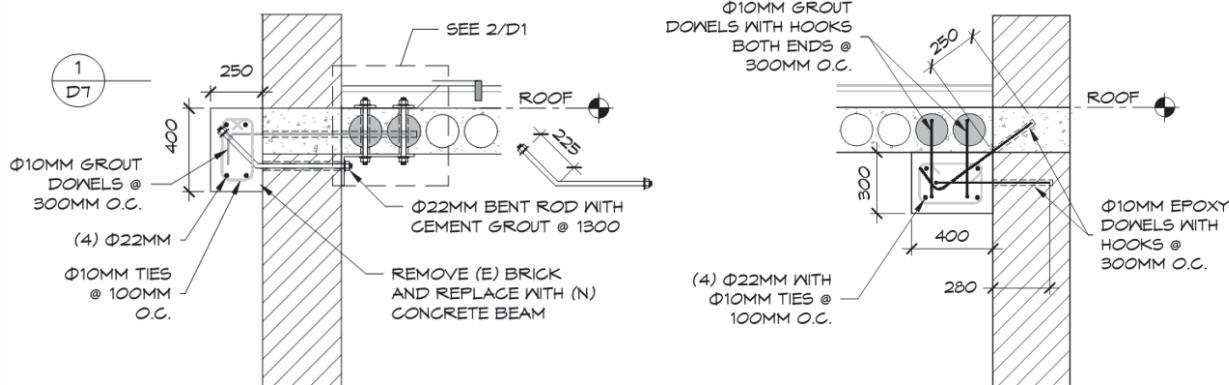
Detail of transverse wall to belt beam connection in CMCF Increment 1.
